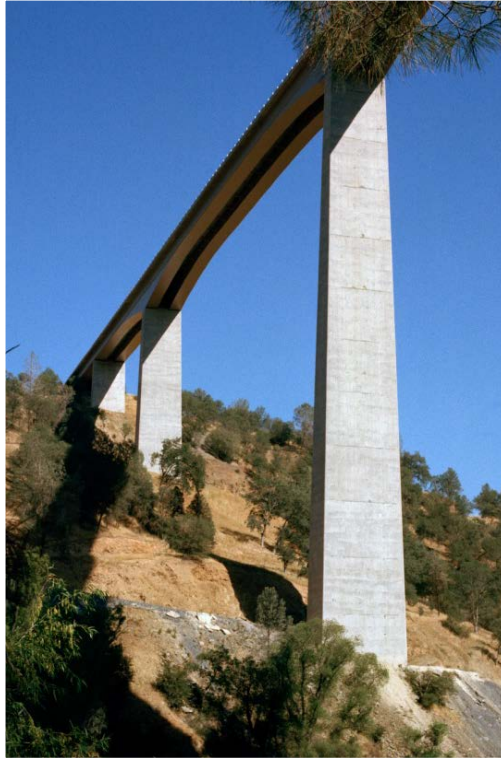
Archie Stevenot Bridge – District 10 (Route 49)
